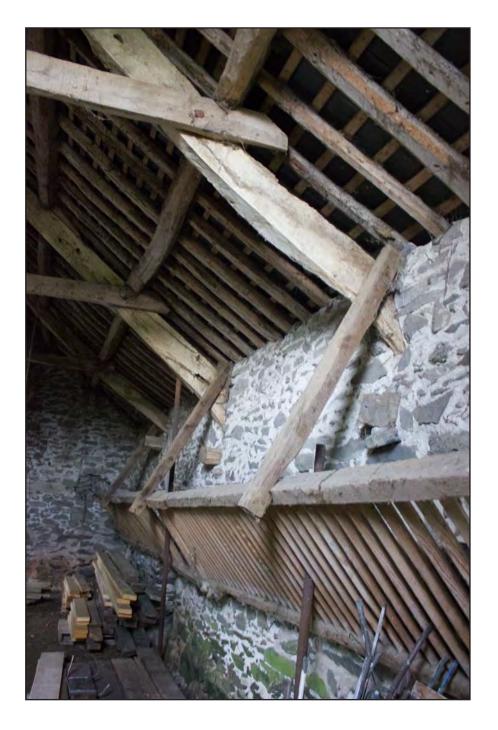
Oblique internal shot of Building 4 - Cowhouse/Shippon at Gaer Gerrig, Llangwm, Conwy - from the northeast - 2.00m scale
